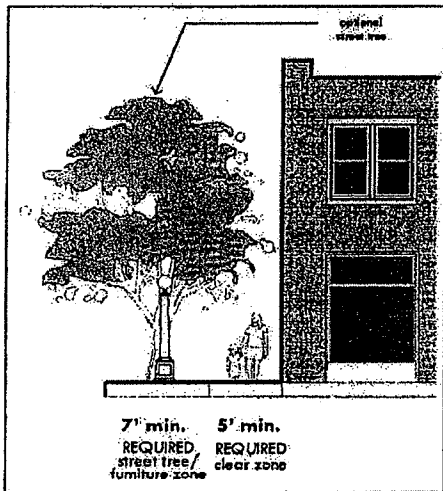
Urban roadway sidewalk width requirements. Note that street trees are optional on urban roadways.
